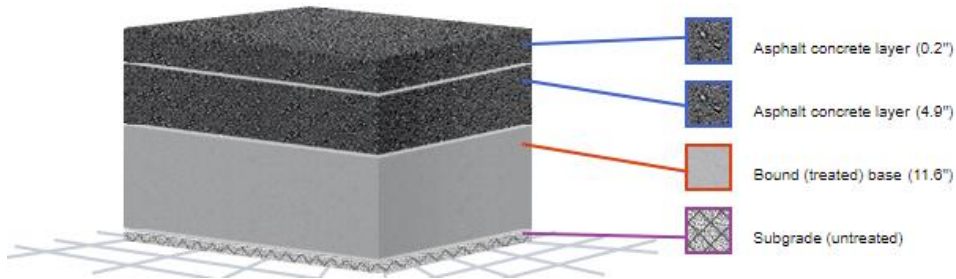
Pavement Structure for CA-8202 Section (Source:InfoPave).
